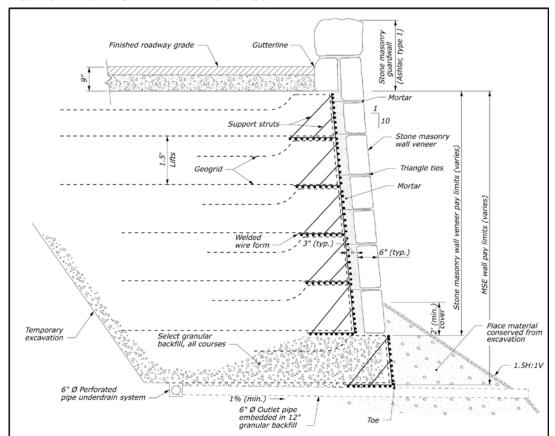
TYPICAL MSE WALL WITH ASHLAR GUARDWALL
